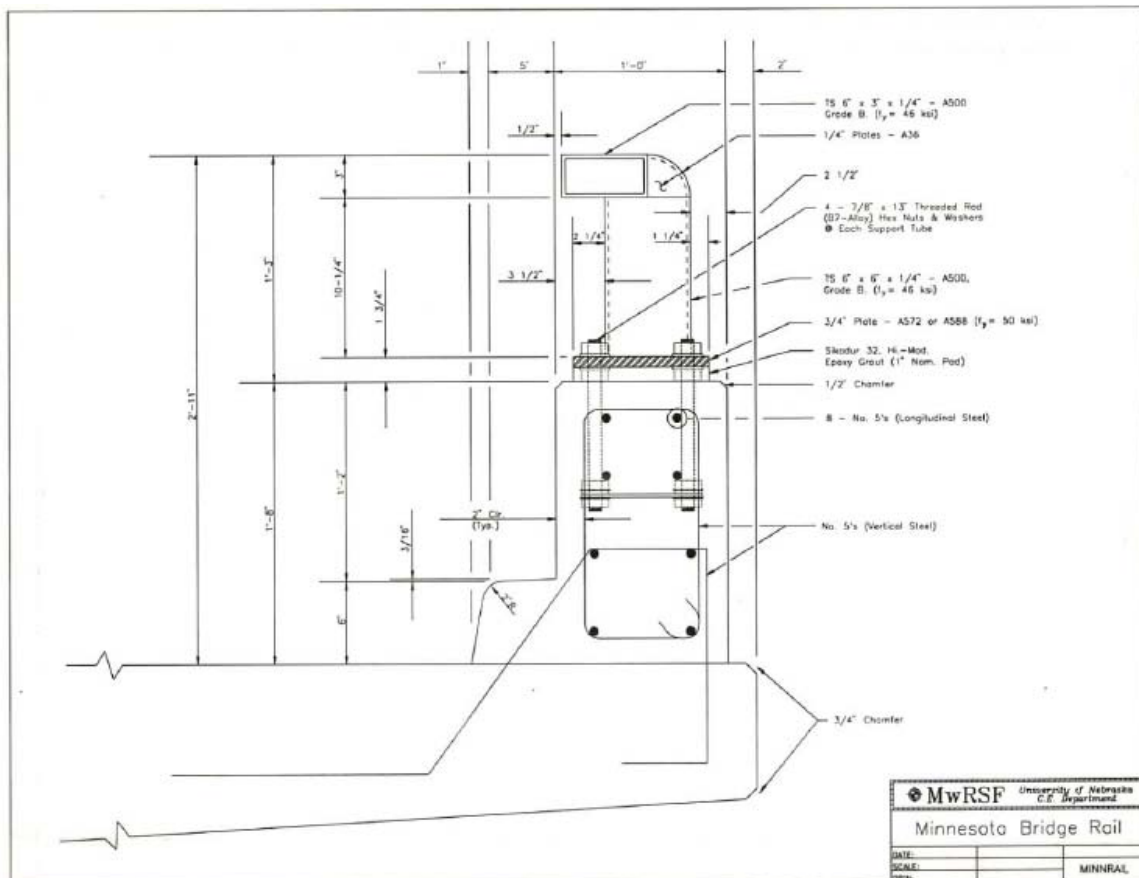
Cross-section of the original crash-tested version of the Minnesota Type Three Combination Bridge Railing.²
